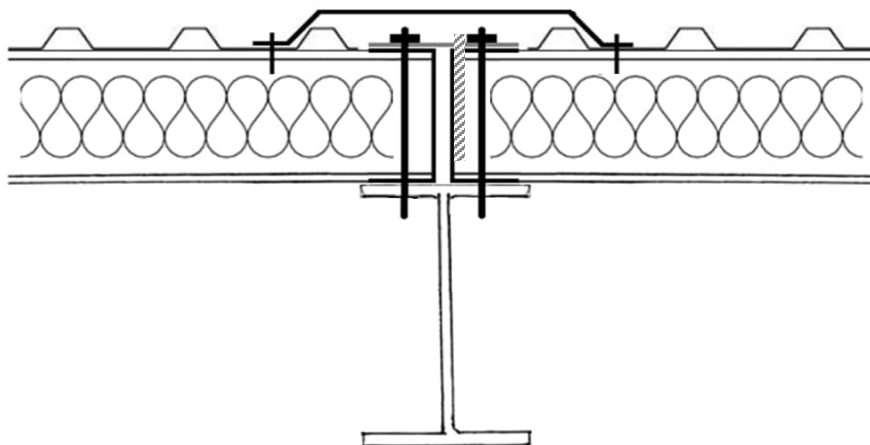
Use of pre-fabricated insulated roof cassettes supported on the top flange [5]
